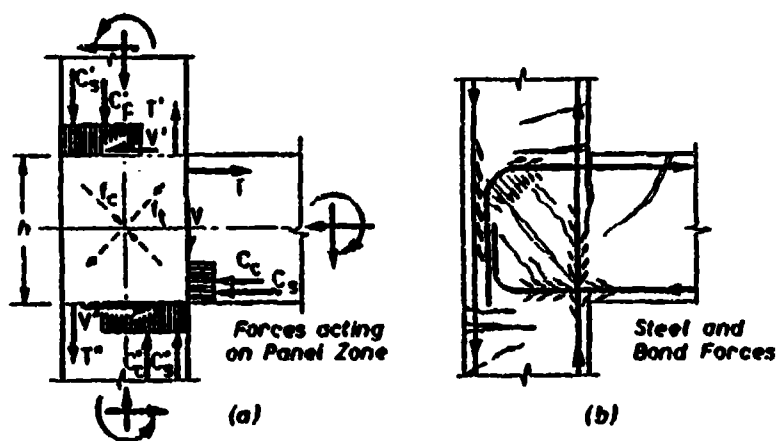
Exterior column-beam joint: (a) stress resultants (b) crack pattern and bond forces. (Park and Paulay '75)
